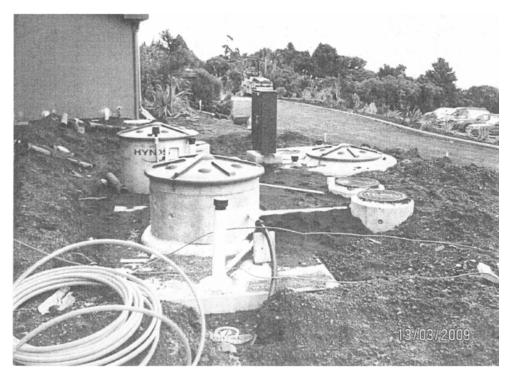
Hynds SAF wastewater treatment system installed in front of existing visitor centre (photo taken prior to backfill, from 2009 building consent)
